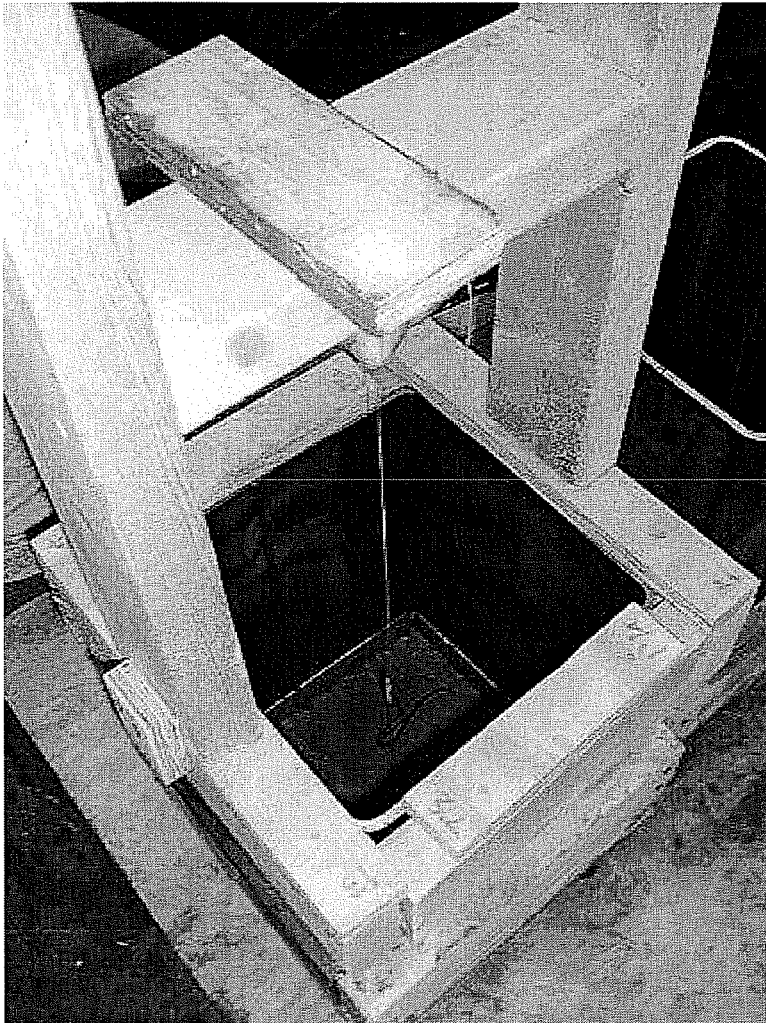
Short column specimen prior to casting of the infilled concrete.
